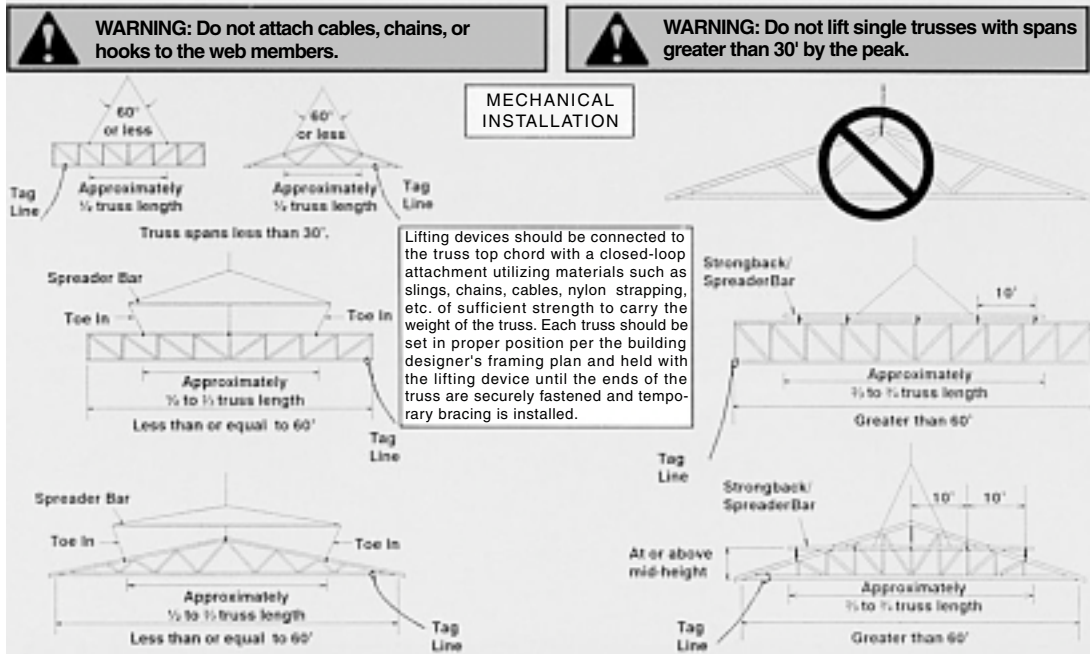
Lifting trusses by crane. (Reproduced from HIB-91, courtesy of Truss Plate Institute, Inc.)
